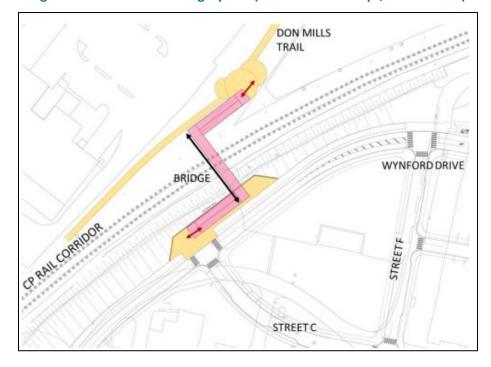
Elevated Crossing Option (Alternative Concept, Switchbacks)
